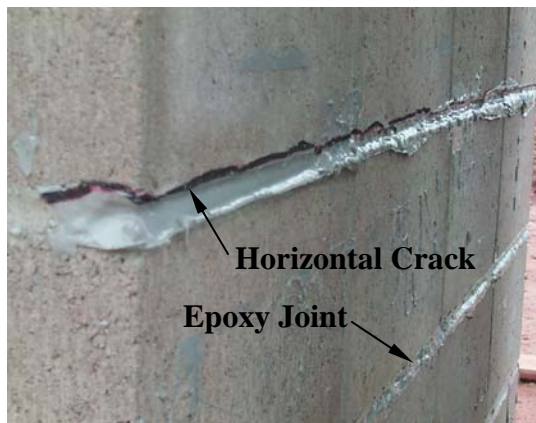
Horizontal Crack in Epoxy Joint in Wall A1 after Event #5
